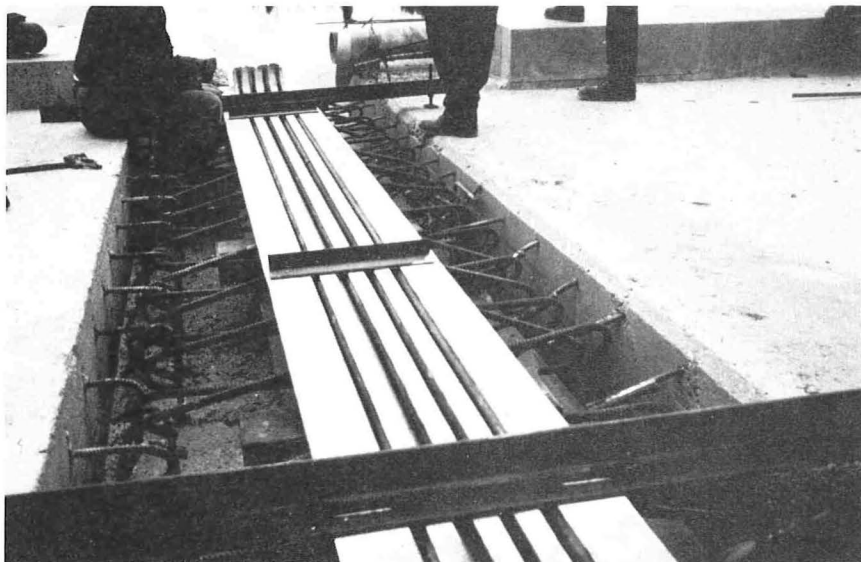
Installation of a 4-tube modular sealing system on Florenceville Bridge showing positioning member for perfect surface alignment.
